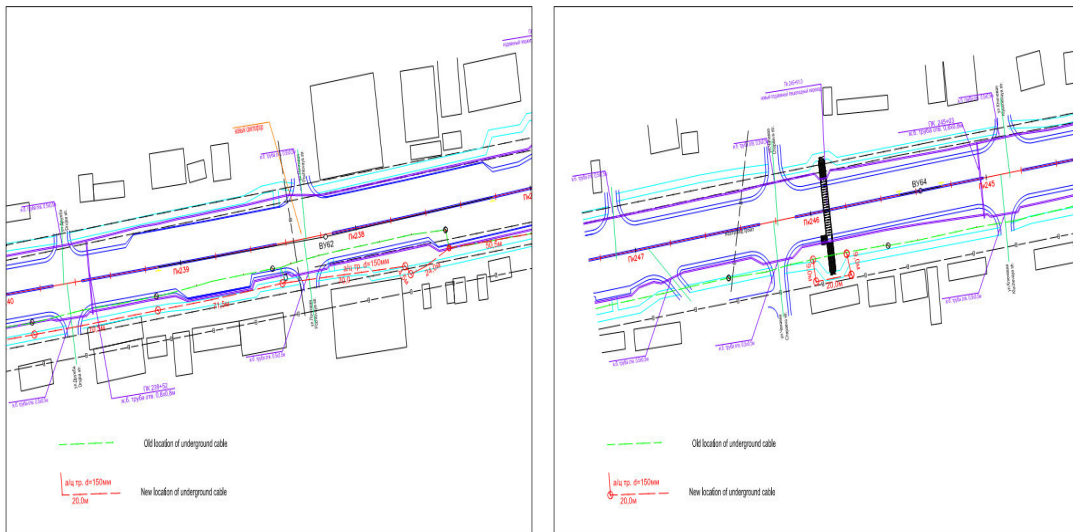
Placing the Concrete Tubes for the Underground Communication Cables
